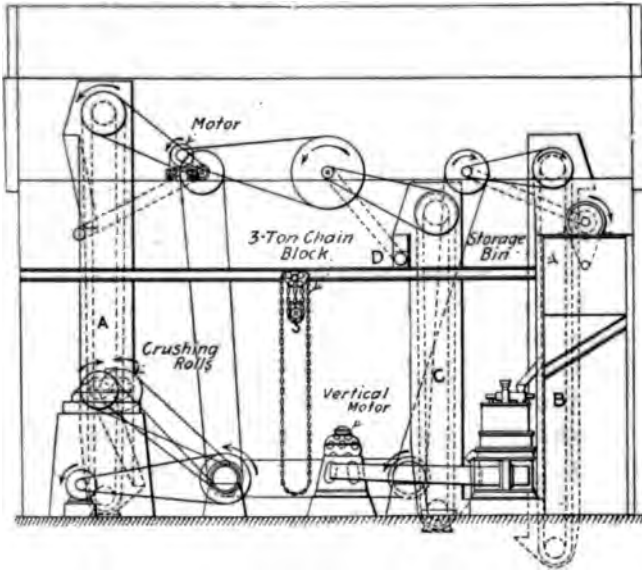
40-FT. BY 60-FT. COAL MILL, ELEVATION SHOWING FULLER MILLS
